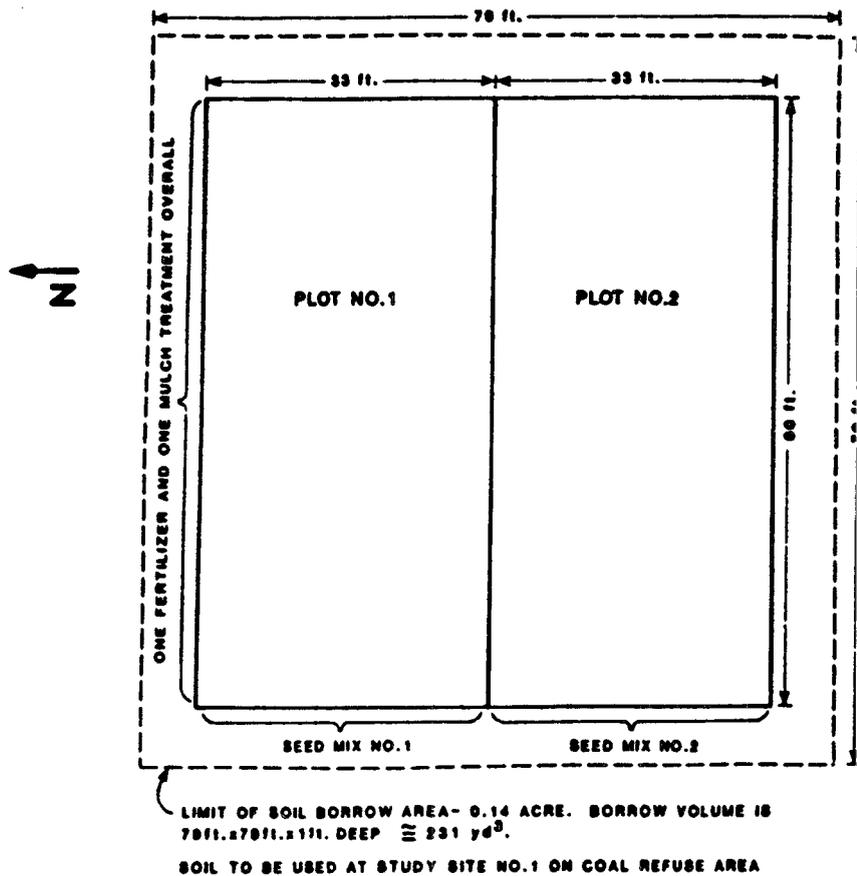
LAYOUT OF "STUDY SITE NUMBER 2" TO BE LOCATED AT BORROW SITE IN SAGEBRUSH VEGETATION ZONE EAST OF COAL SLURRY IMPOUNDMENTS.
